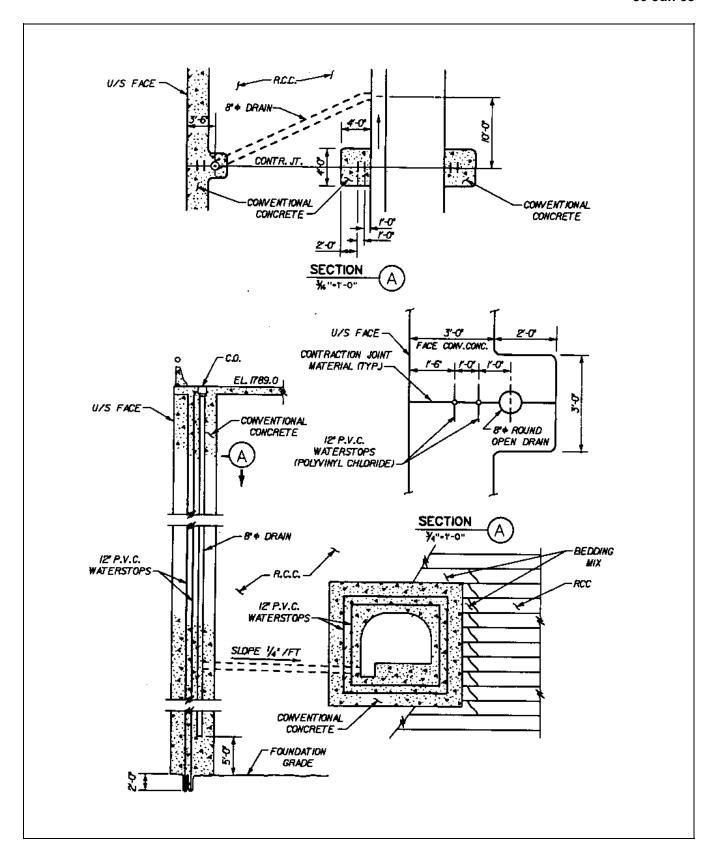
Typical internal waterstops and joint drain construction in RCC dams
